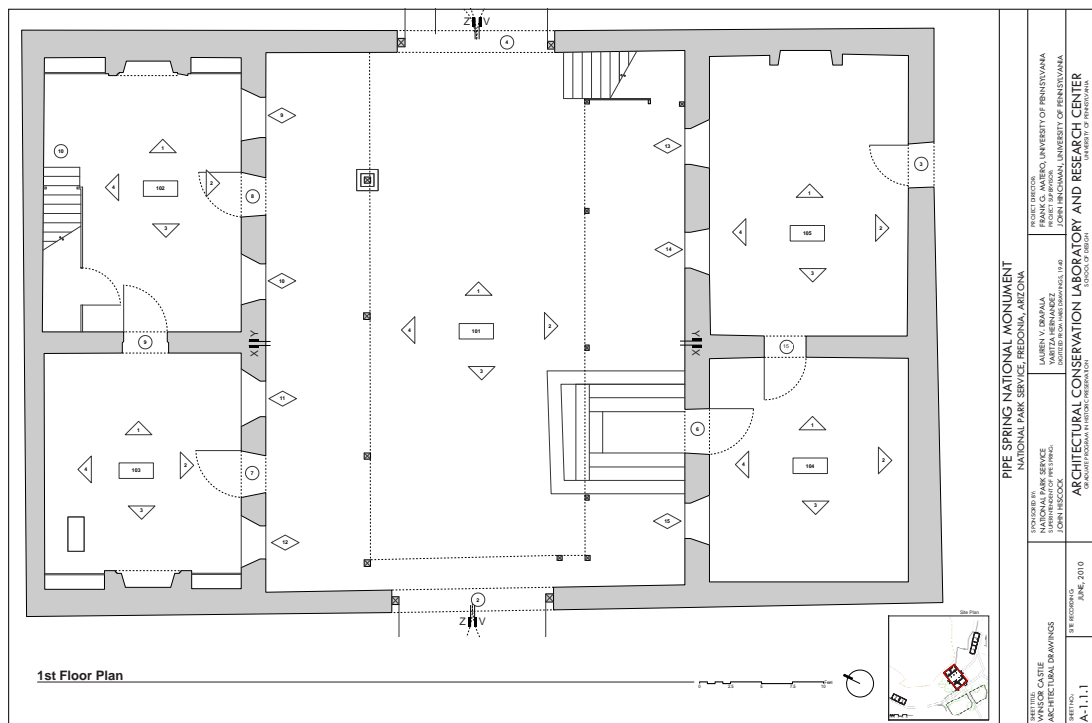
The Architectural Conservation Laboratory, “First floor plan, Winsor Castle” (June 2010).
